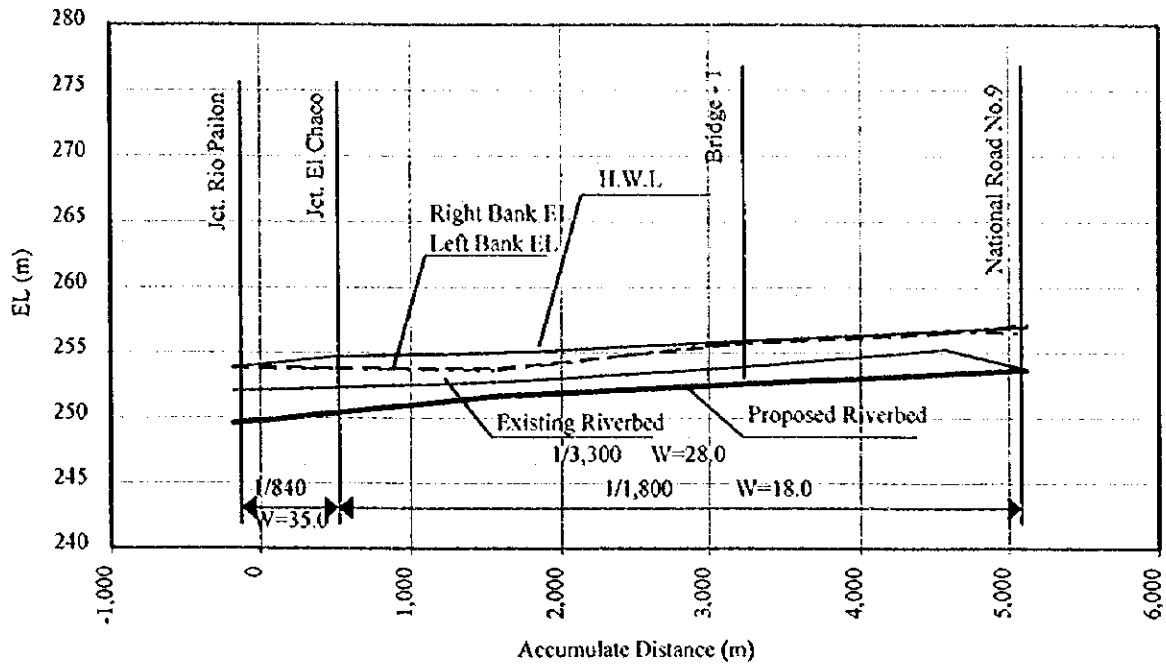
(1) LONGITUDINAL PROFILE OF DRAINAGE IMPROVEMENT
